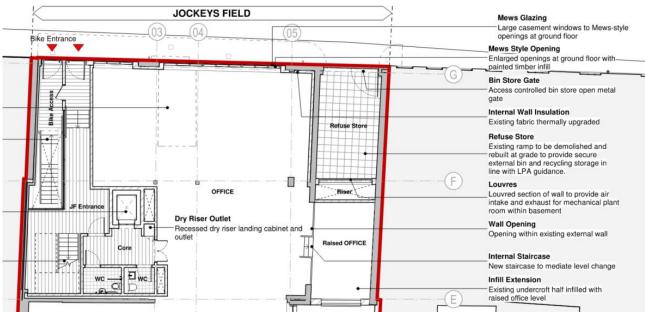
Proposed ground floor plan showing location of refuse store (Wst 03 Operational waste facilities)
